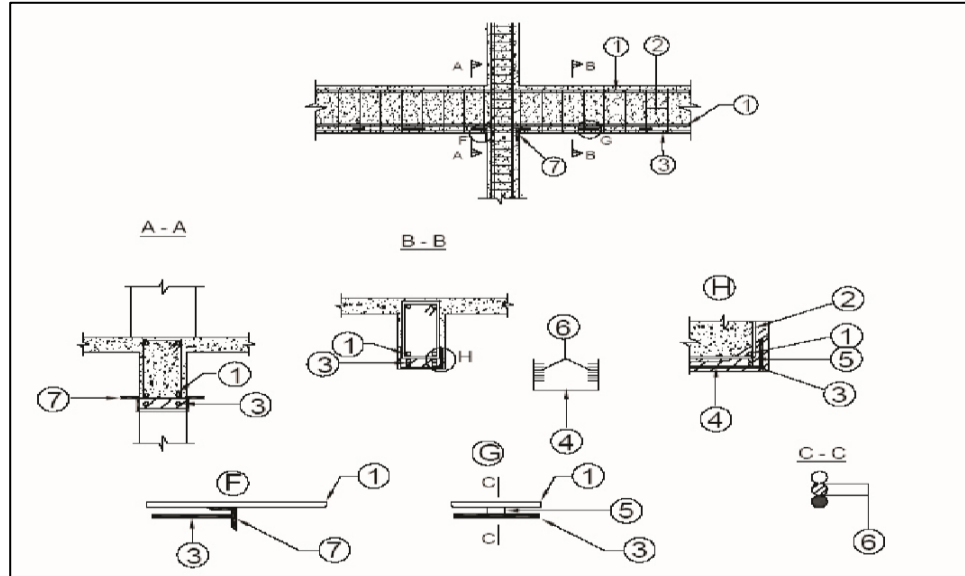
Strengthening of concrete beams by one-sided jacketing (1. Existing reinforcement; 2. Existing stirrups; 3. Added longitudinal reinforcement; 4. Added stirrups; 5. Welded connecting bar; 6. Welding; 7. Collar of angle profile)
